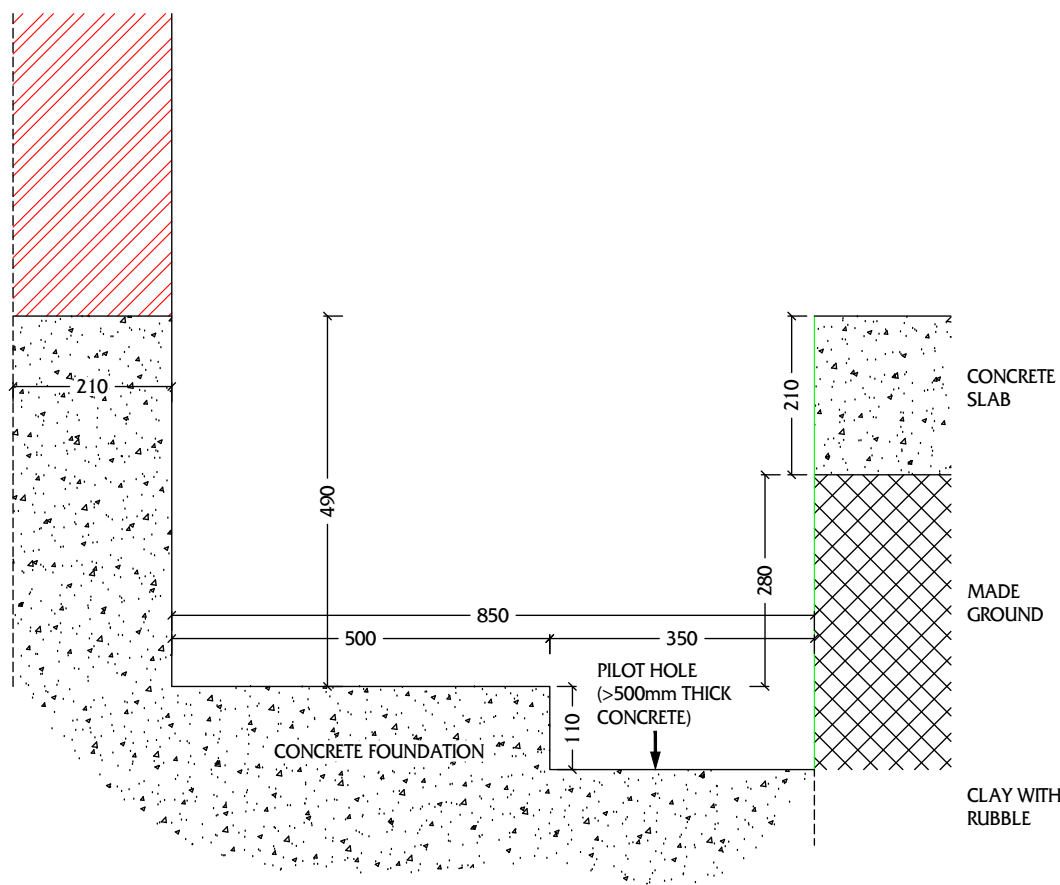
PART SECTION C-C LOOKING SOUTH THROUGH TRIAL PIT TP3 SCALE 1:10
